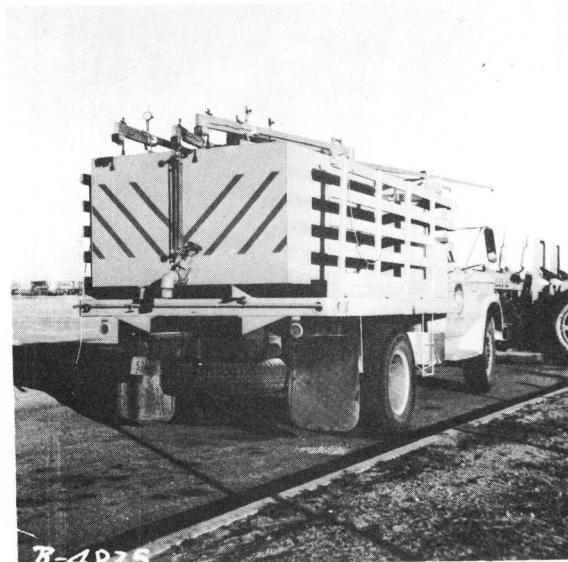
Completed Truck Carrying Benkelman Beams On Location
